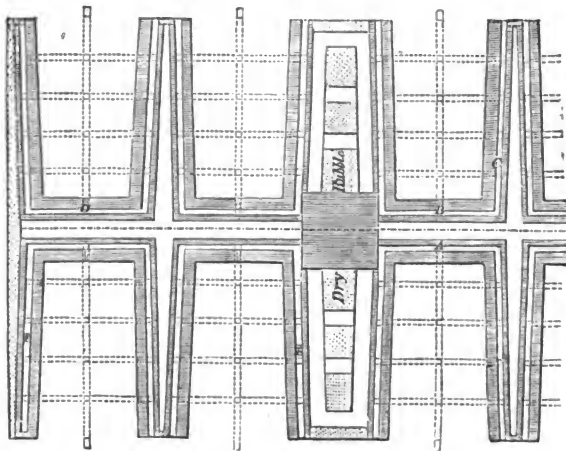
Coke-Oven. Ground or Floor Plan.
